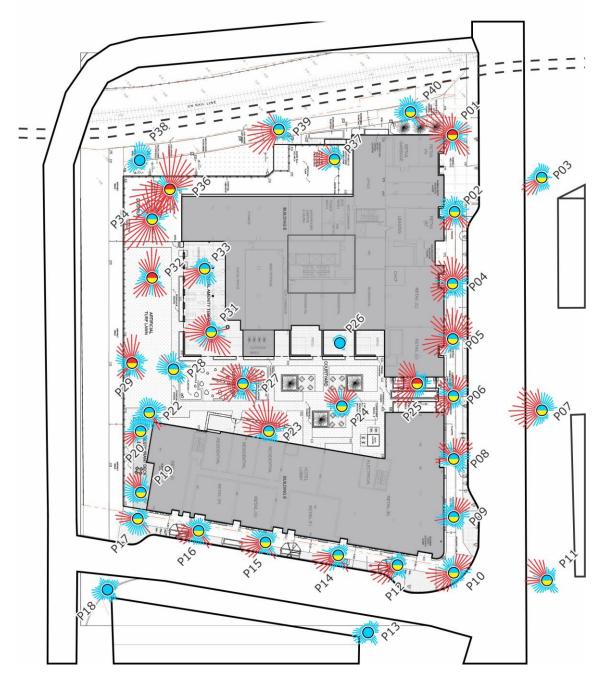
Wind Tunnel Results (Summer) – Parking Level 0 and Level 1 Plan Proposed Site Conditions (results shown without treatments applied)
